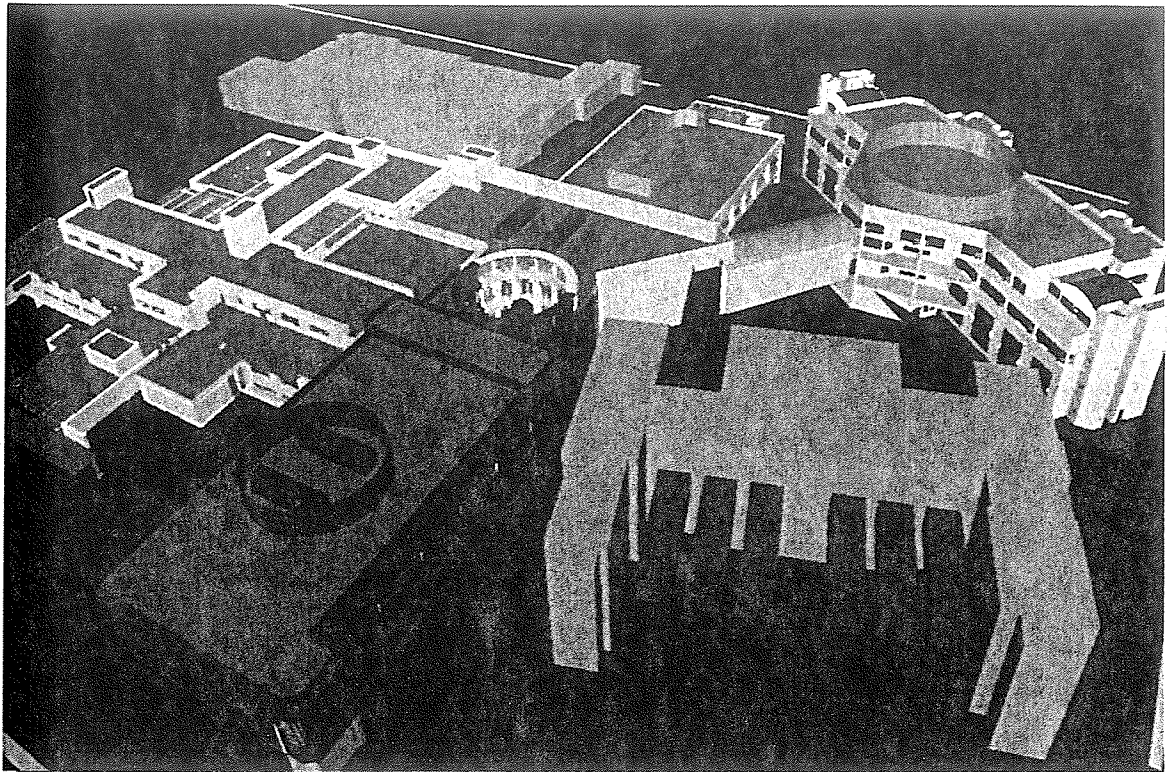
July 1996 East Wing has been demolished and new Clinics Building and second half of North Addition is under construction in its place. Nursing Wing work has moved to the interior.
